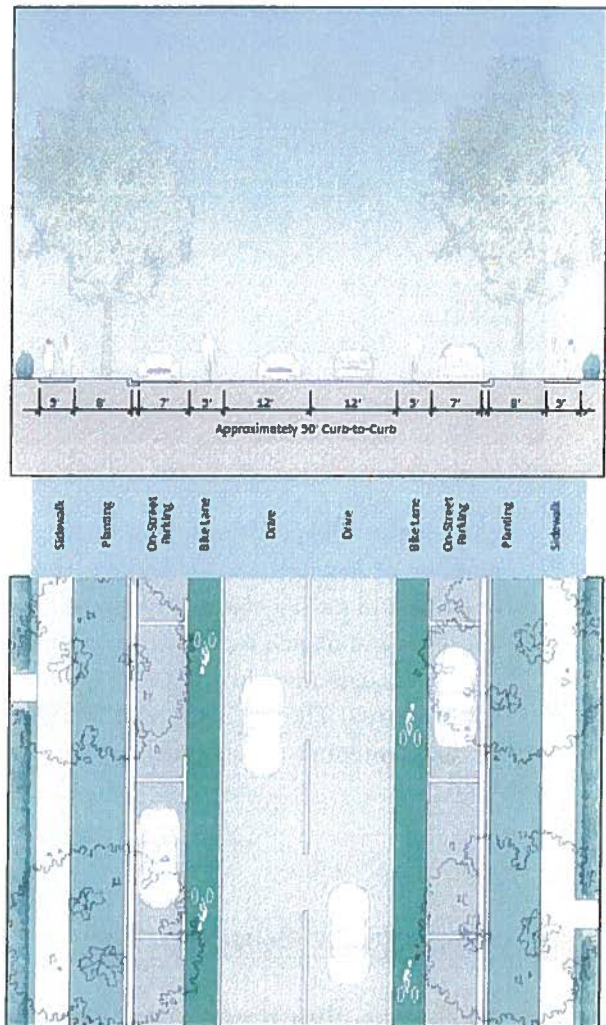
Street Sections – Illustrative Typical Section of Grace Street
